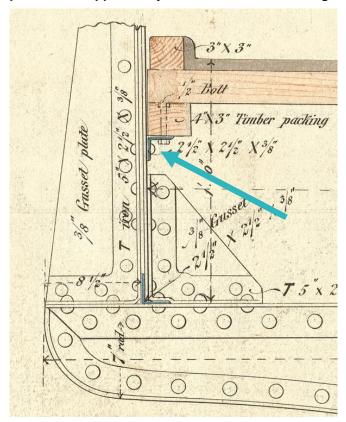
Cross-section through existing parapet, showing how the timber footway planks are supported by the middle horizontal angle member
